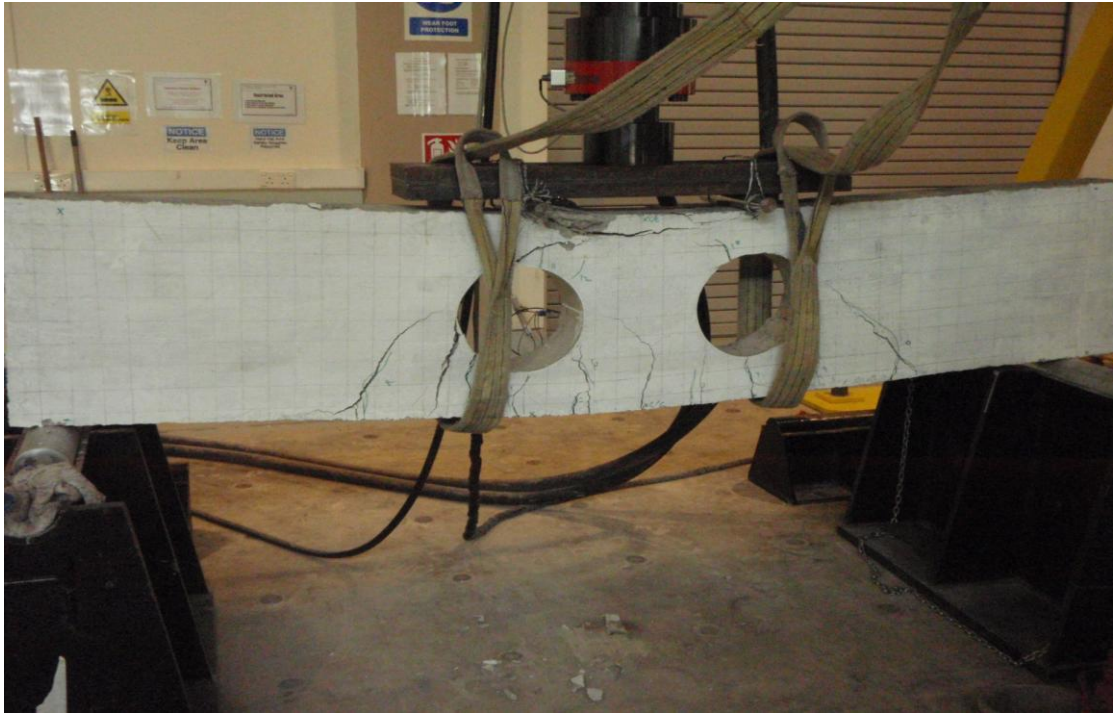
Failure Mode of Beam with Circular Opening with CFRP Sheets subjected to Static Load
